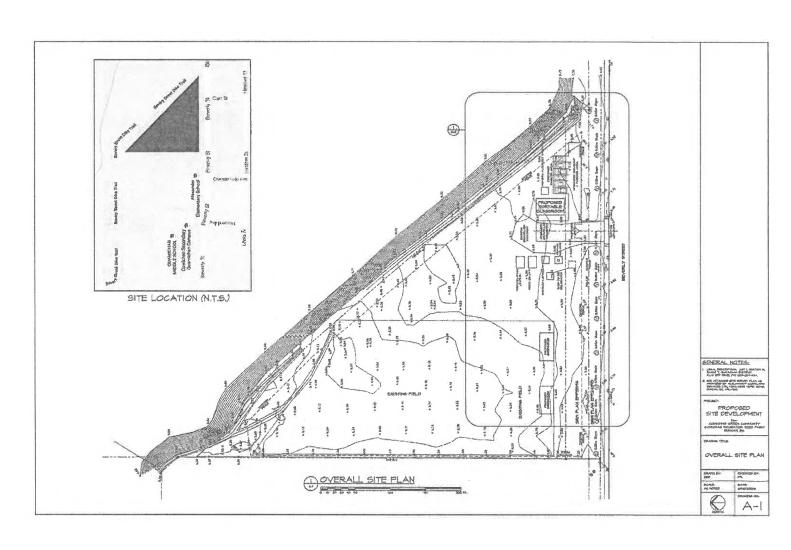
LEGAL PLAN OF THE SITE (EPP35195) 2431 BEVERLY STREET.
